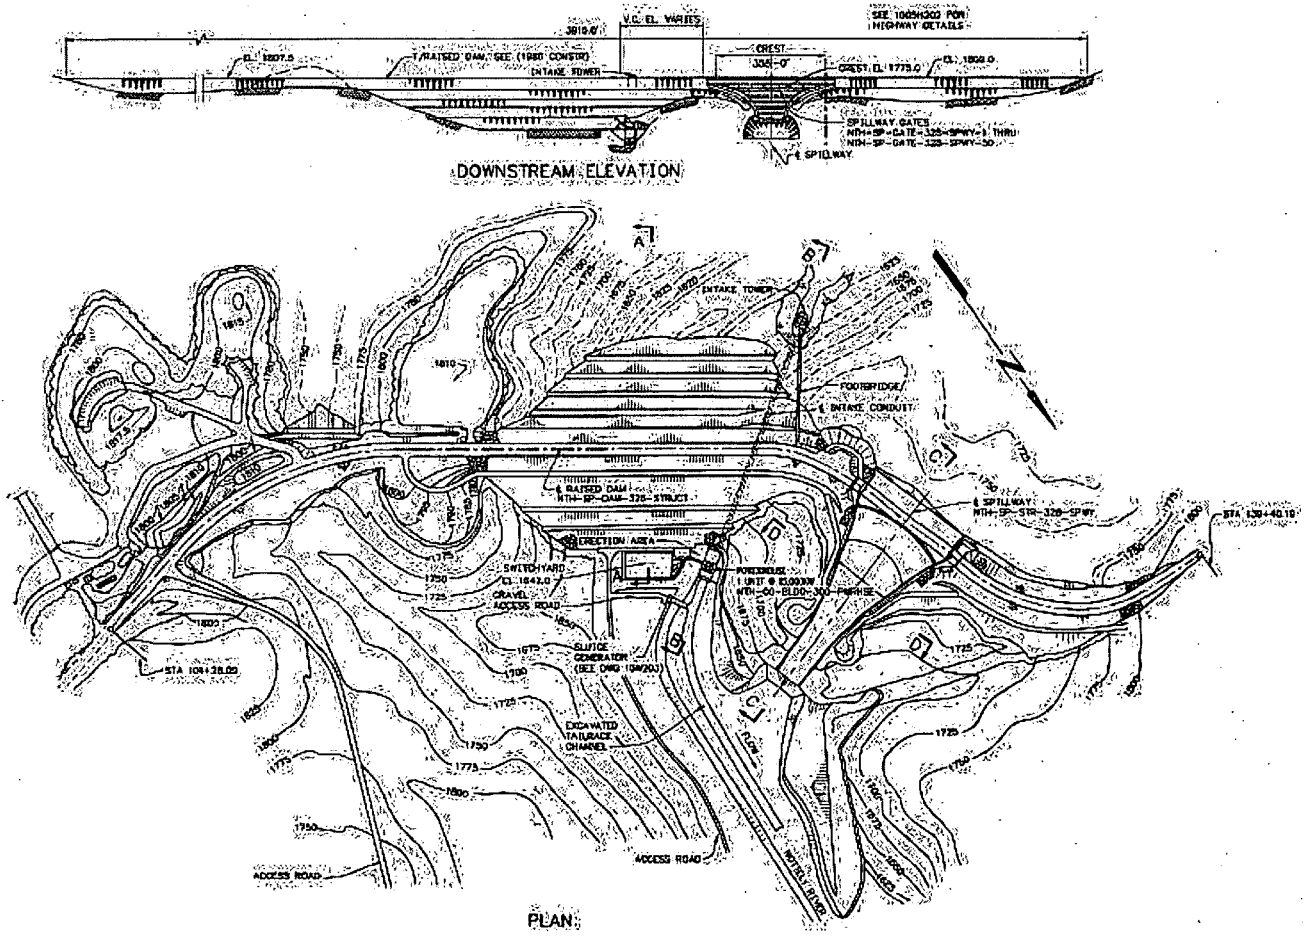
Nottely Dam, General Plan and Elevation (Reference 2.1.1)
